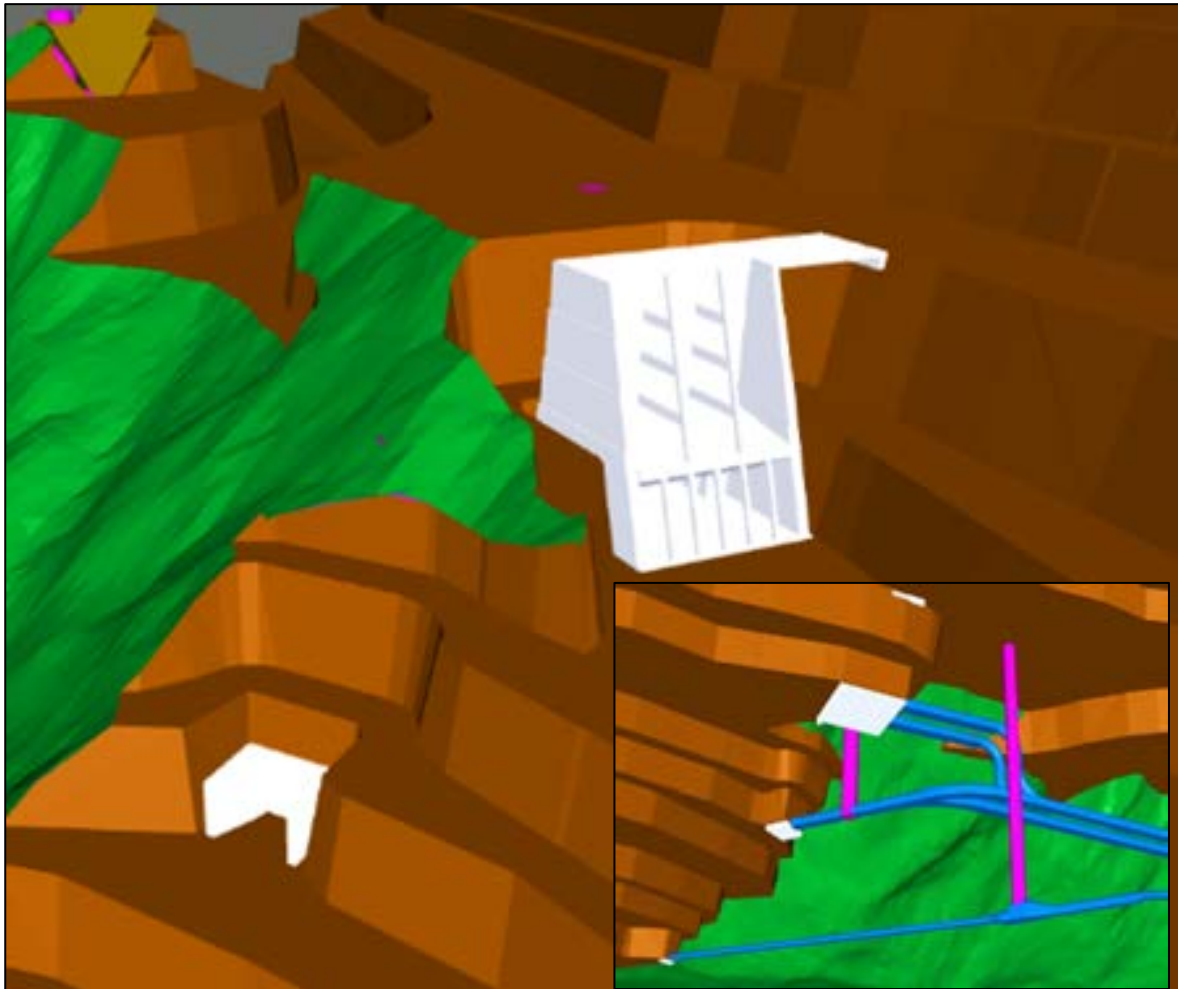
3D models of intake structures (aerial view, inset underground view)
